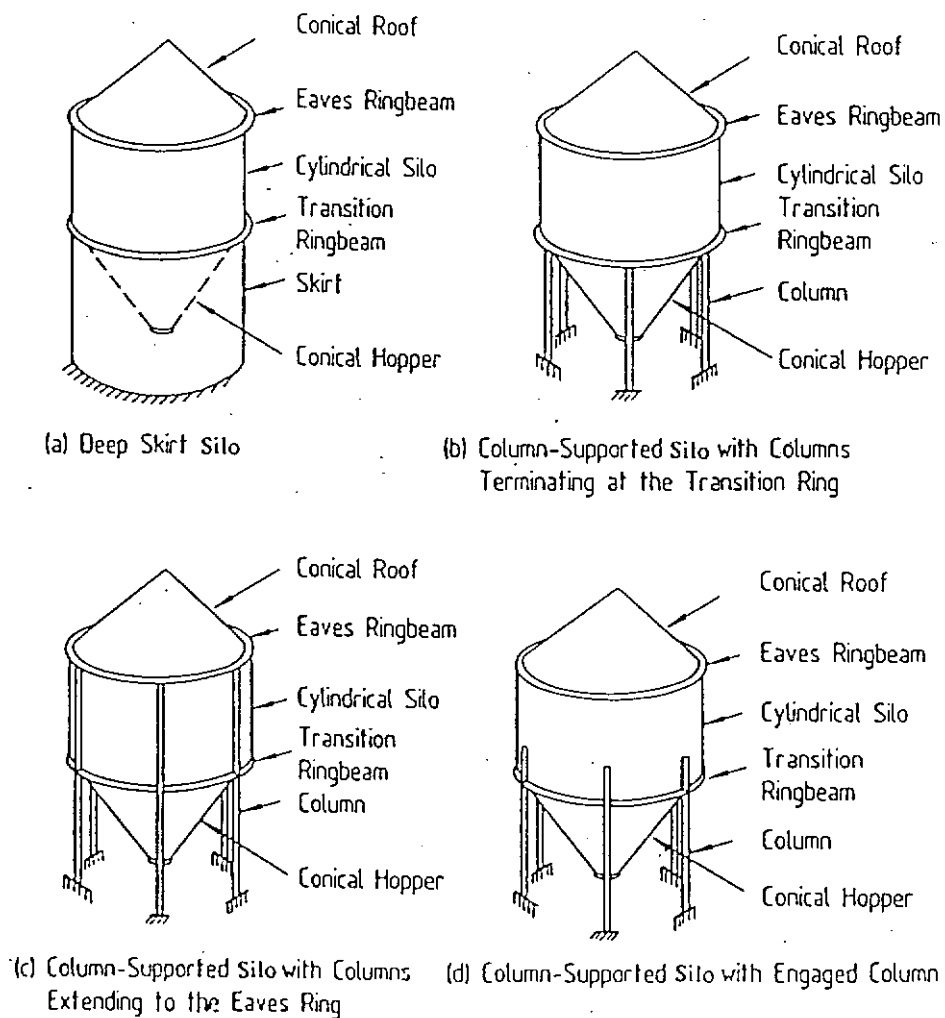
Typical Form of Elevated Steel Silo with a T-Section Ringbeam
